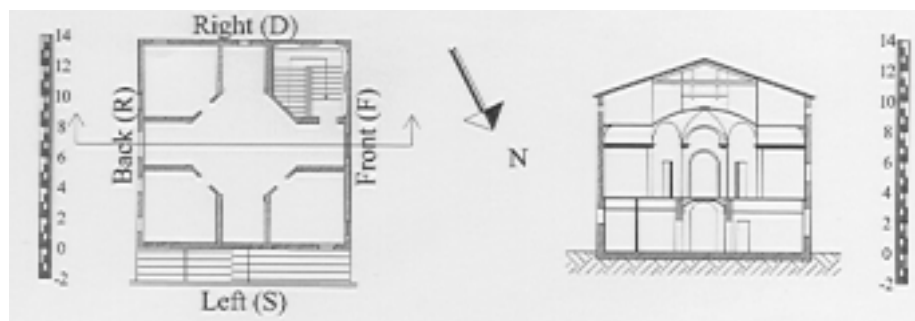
Plan of the 1st floor (on the left) and section (on the right).
